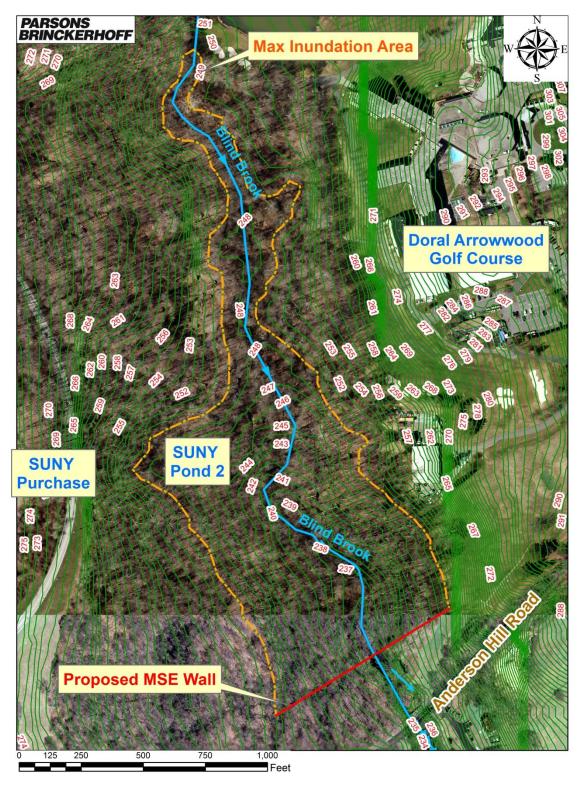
Proposed Detention Pond 2 (Downstream) in SUNY-Purchase
